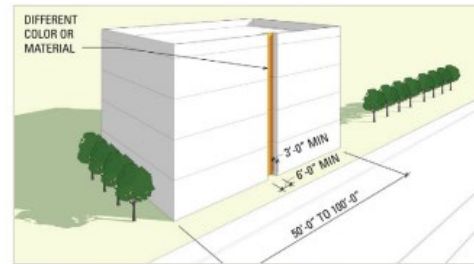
Division of building length; 50' to 100'-wide mid- and high-rise buildings.
